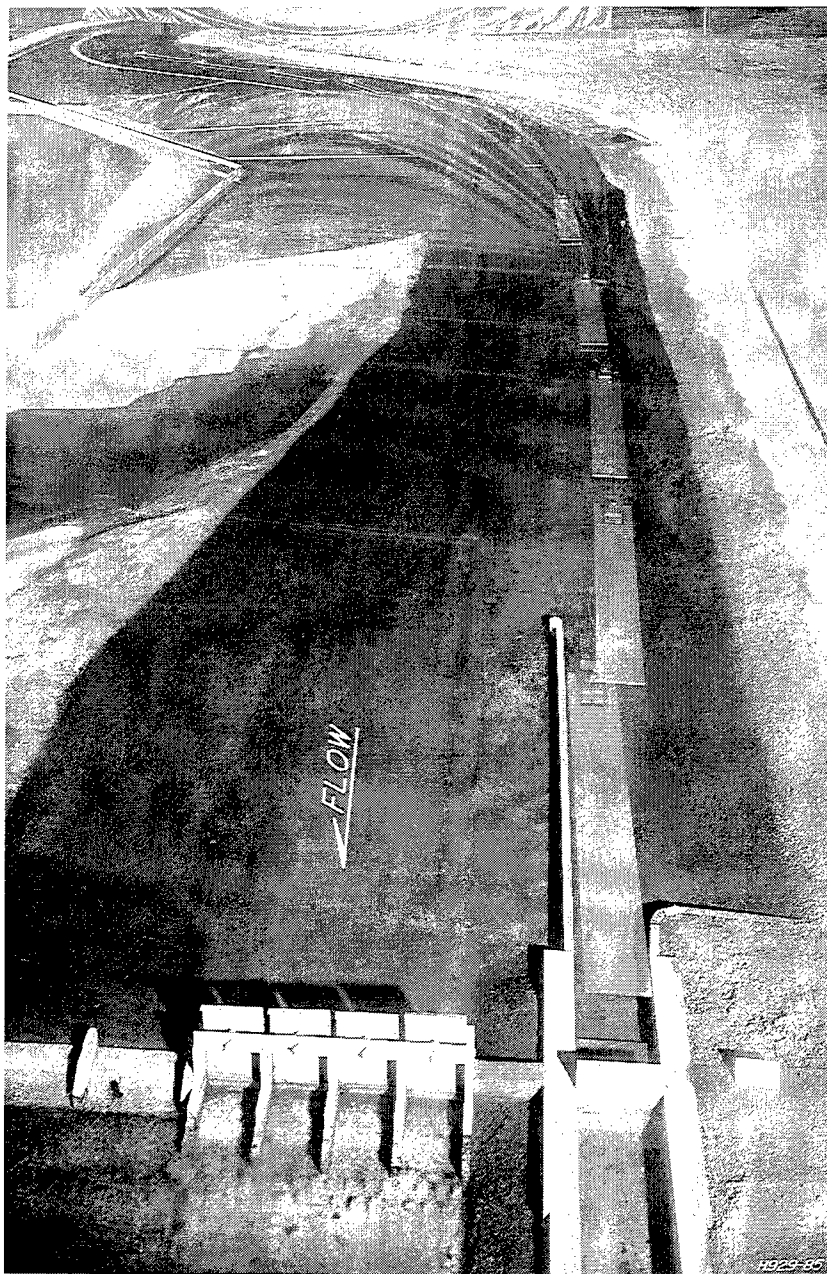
Plan C-2, looking upstream, discharge 60,000 cfs. Path of downbound tow entering the upper lock approach
